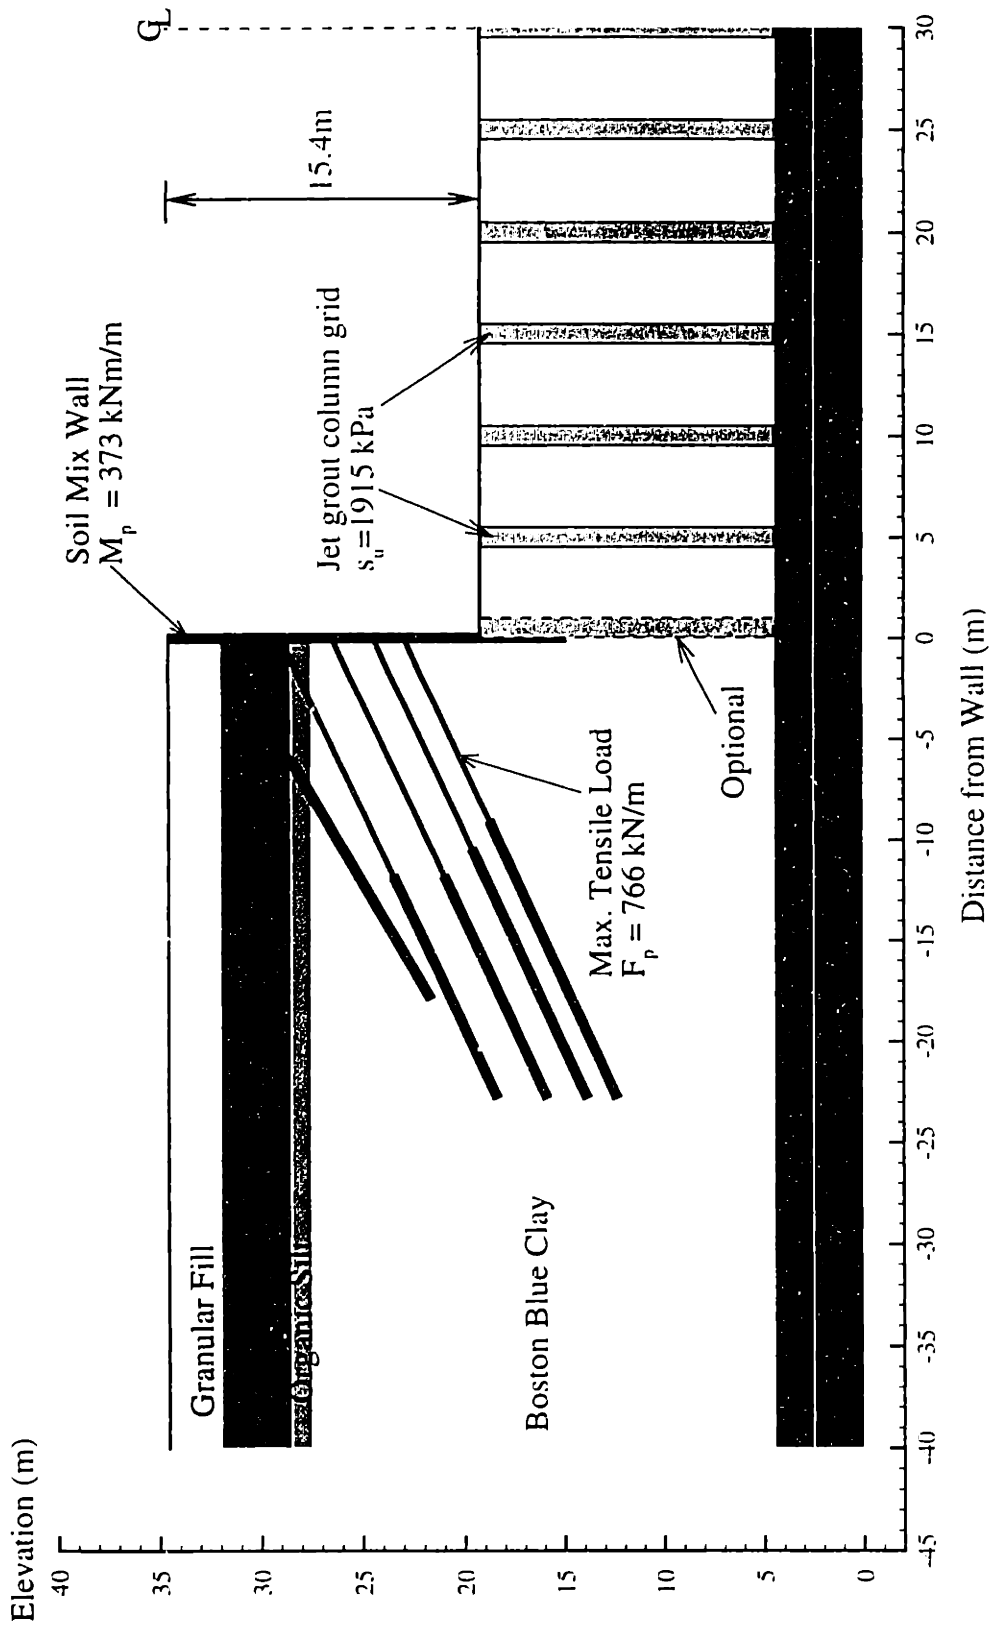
Proposed redesign West wall Section B-B' with a grid of jet grout column
